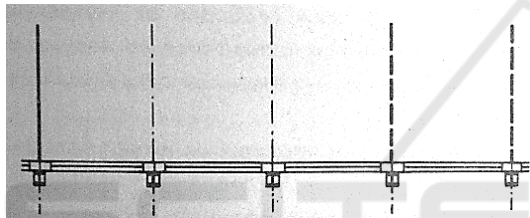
Examples of envelopes, placed behind the structural plane - small scale of the structural pattern.
